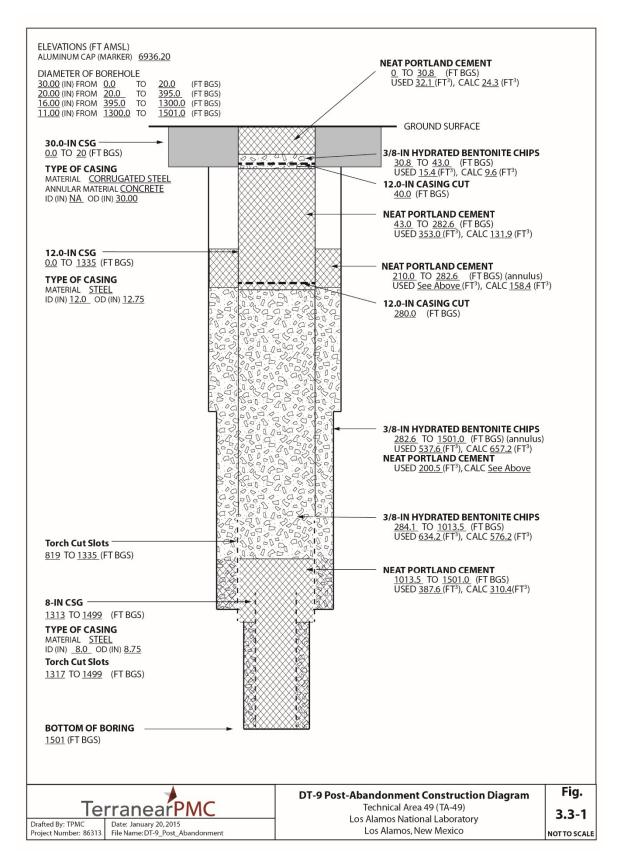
Test well DT-9 post-abandonment construction diagram
